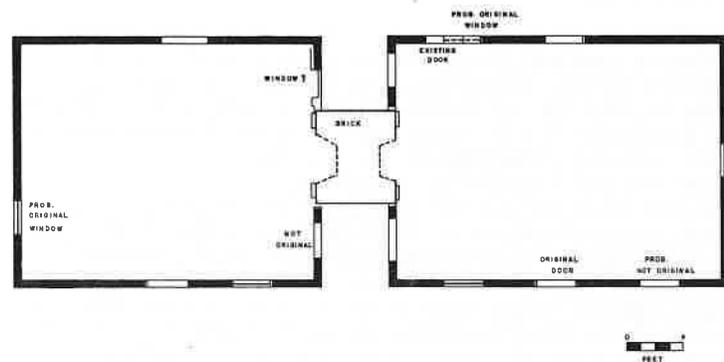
Example of a plan drawing originally drawn at 1/4"=1' scale.
